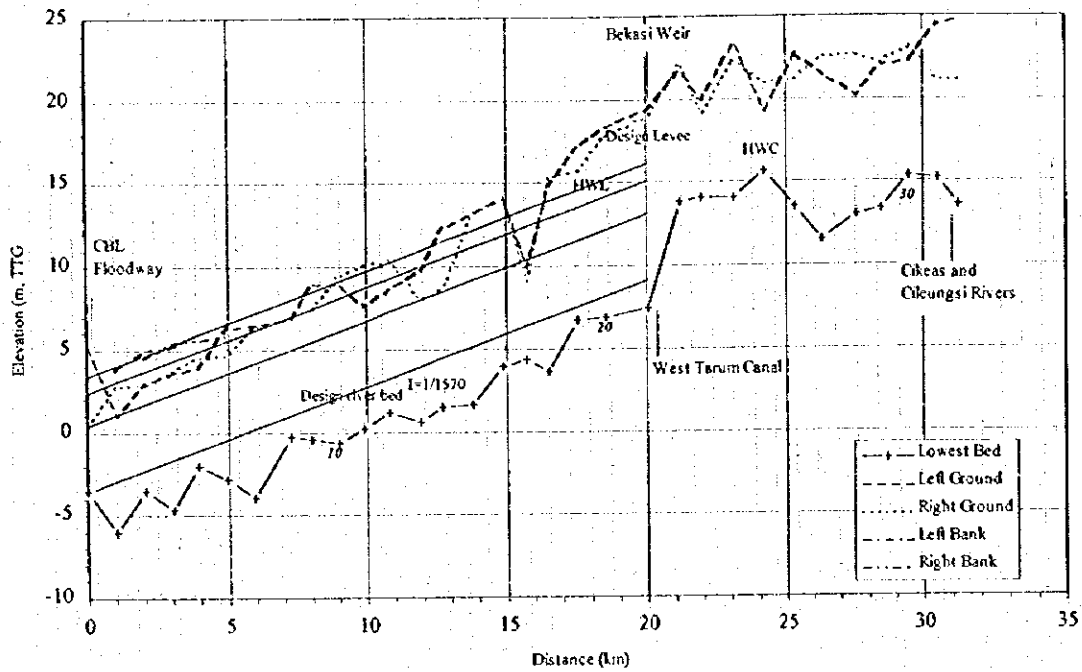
PROPOSED LONGITUDINAL PROFILE AND CROSS SECTION (11/13)
